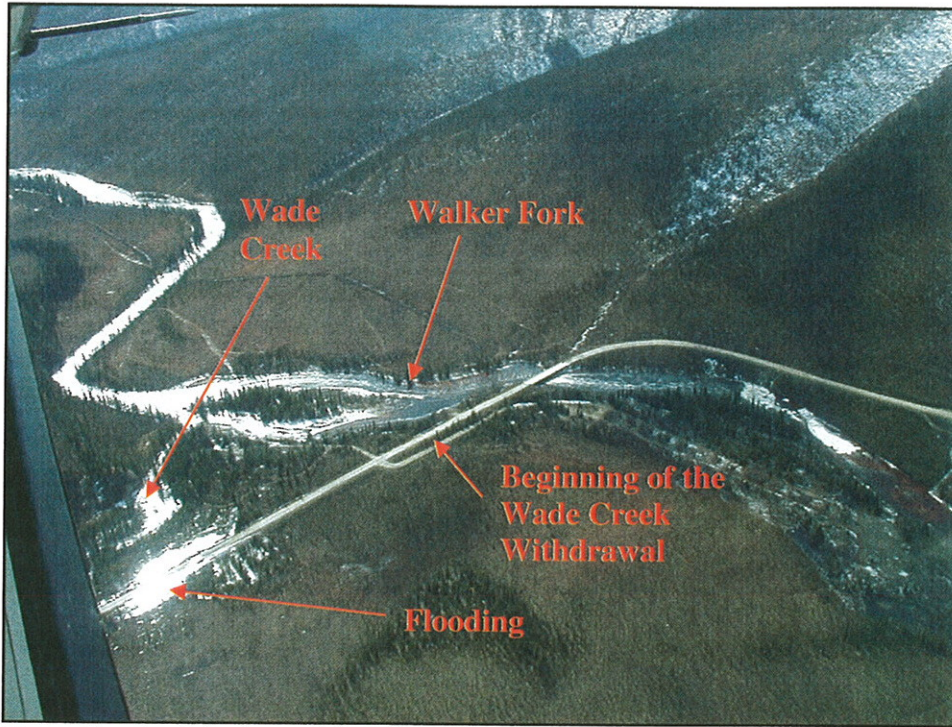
Aerial view of flooding along the Taylor Highway near the Walker Fork Campground. (4/30/03)
